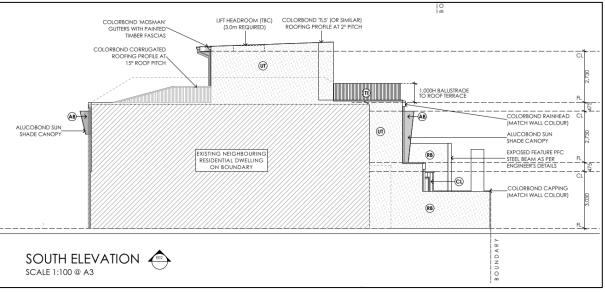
Extract from application plans prepared by Girardi Design detailing the elevation of the proposed dwelling upon Lot 1
